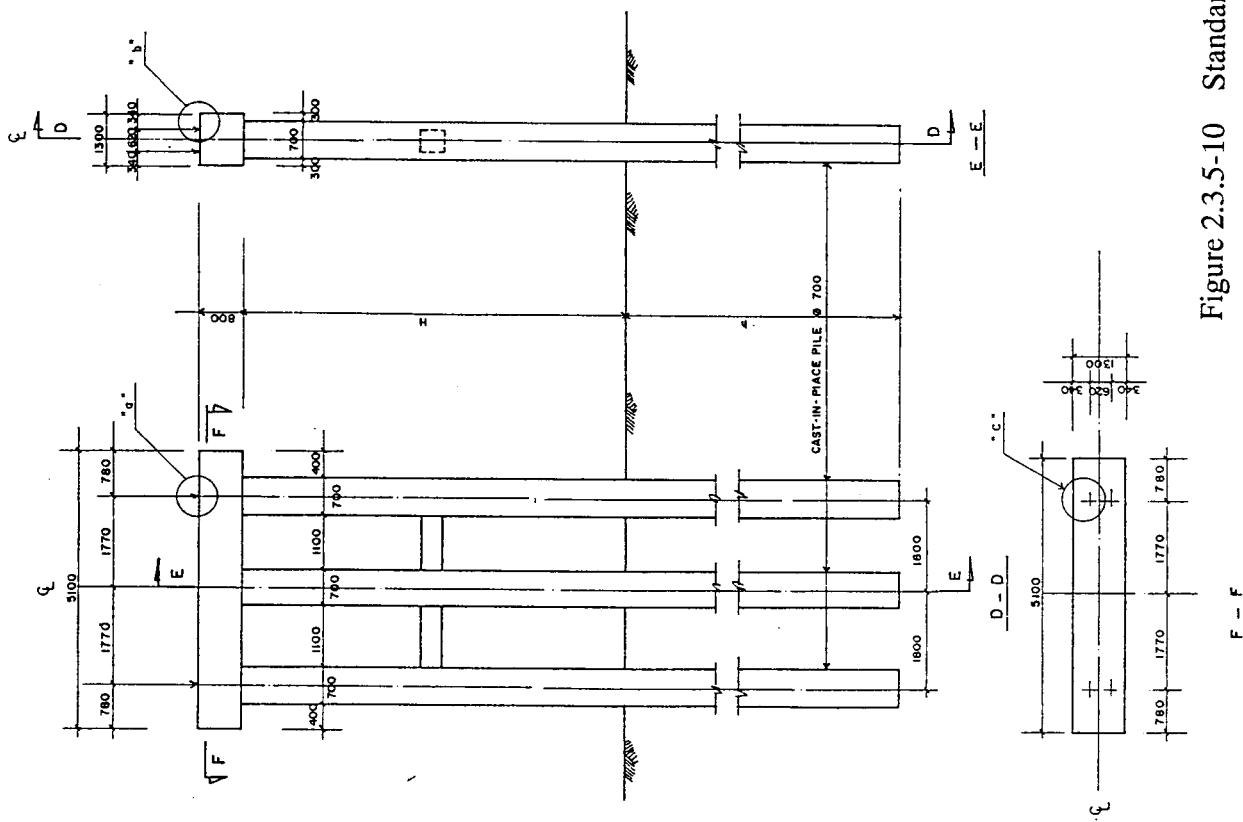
Standard Pile-Bent Pier (Scale : 1:50)
